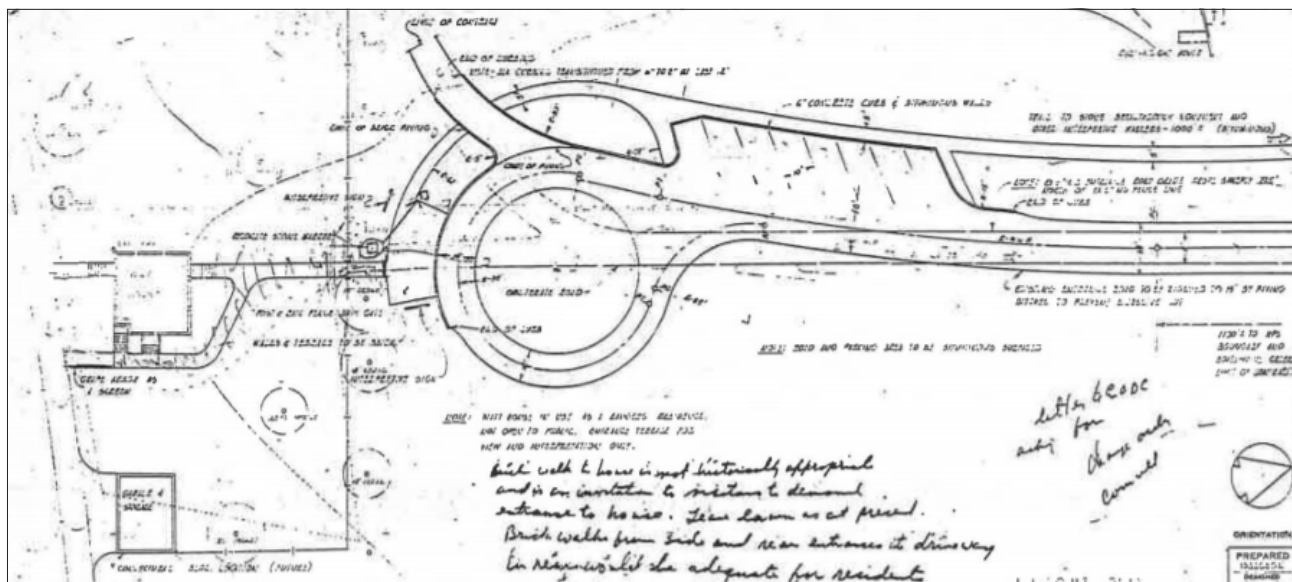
Proposed roads, walks and parking area, Watt house, 1961. Also showing existing layout of fences and locations and species of existing trees (RICH Archives, RICH_367_3032).
